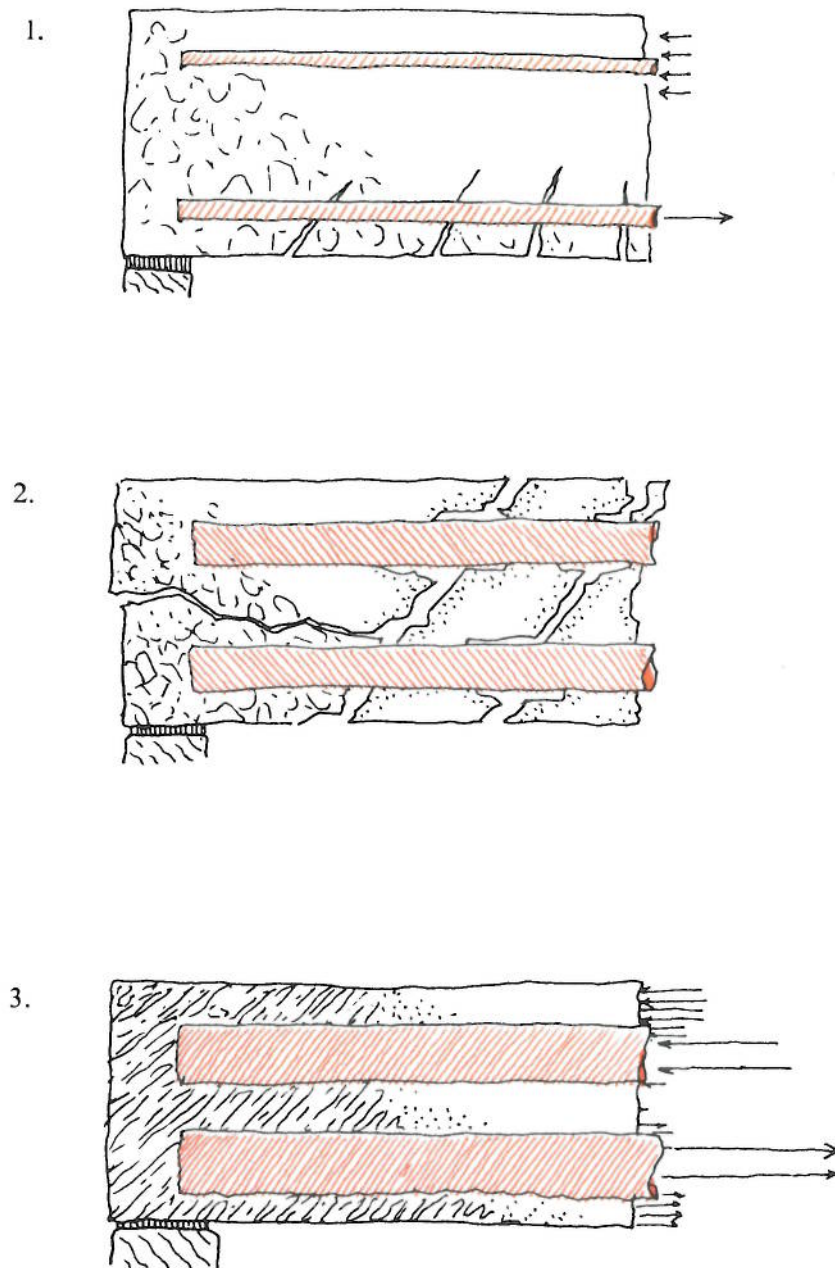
Behaviour of reinforced concrete and CRC under loading.
